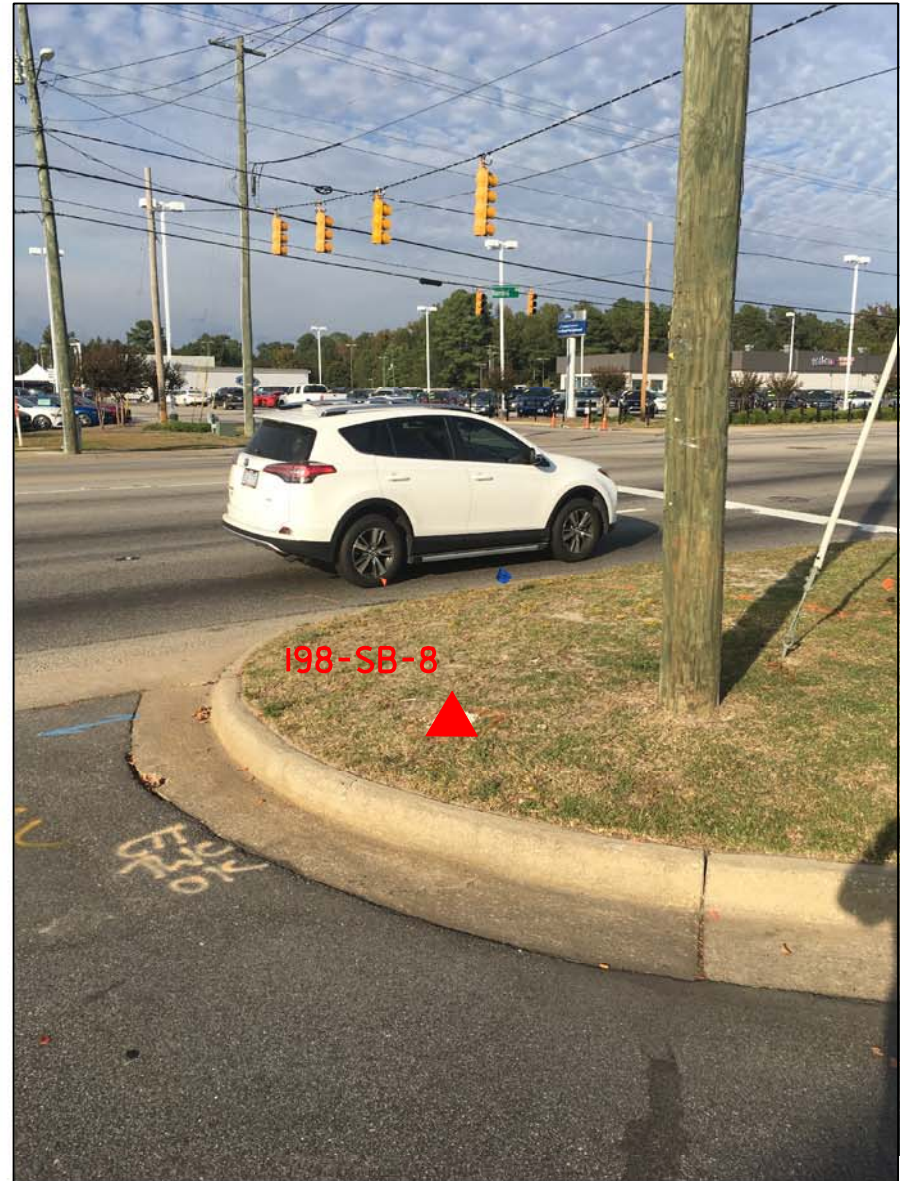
VIEW OF SOIL BORING LOOKING NORTH
